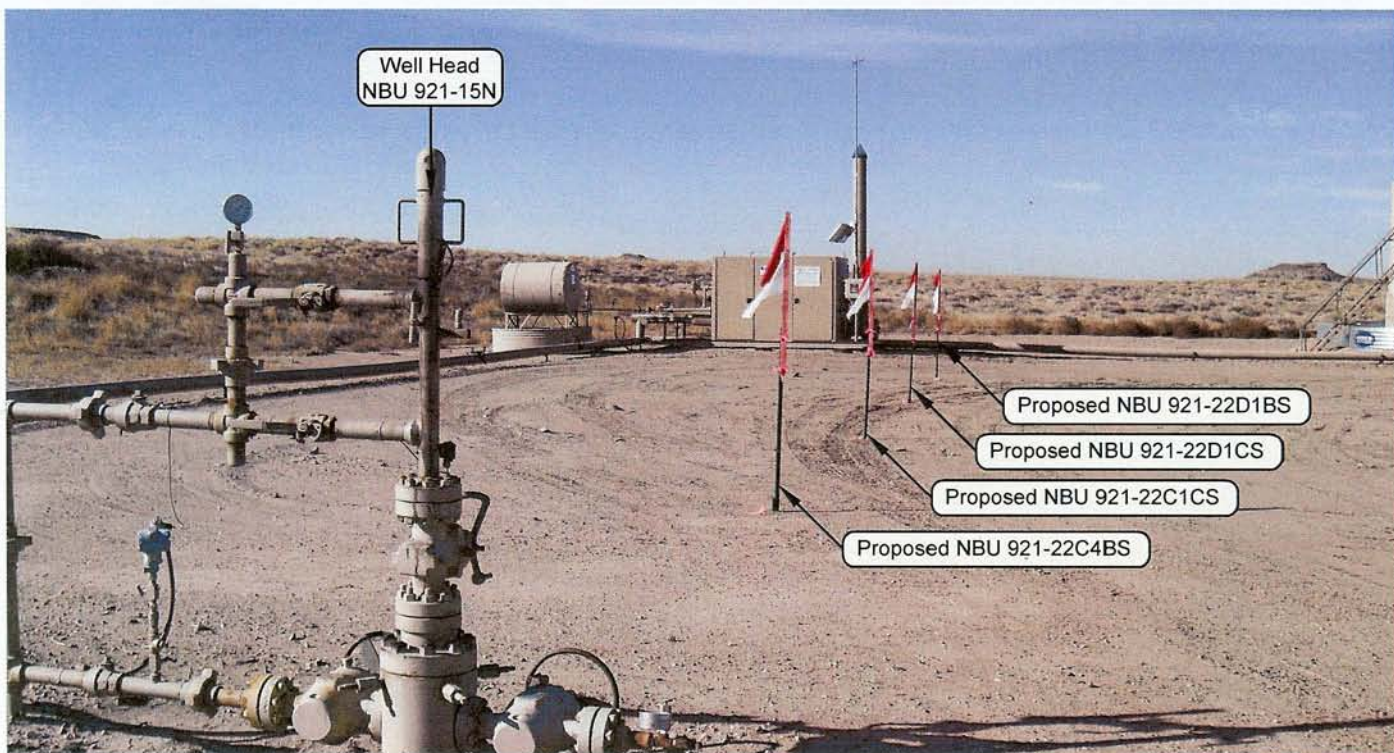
PHOTO VIEW: FROM EXISTING WELL HEAD TO LOCATION STAKES CAMERA ANGLE: SOUTHWESTERLY
